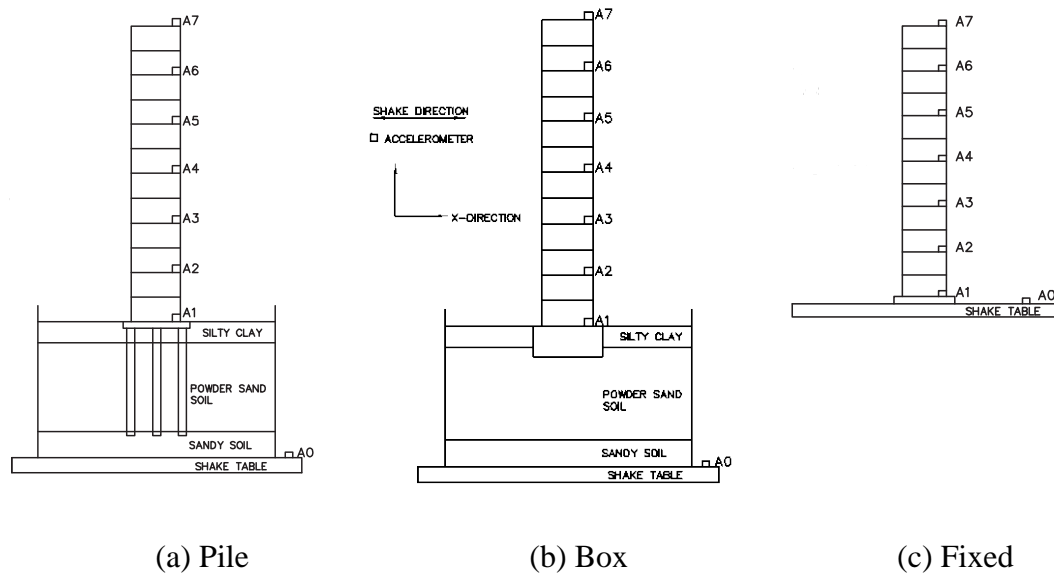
Large-scale reinforced cast-in-place concrete frame models placed on three different foundation types tested on a shake table, and the accelerometer locations installed on the shake table and the superstructures (A0 to A7). The measurement direction for all accelerometers is in x-direction.
